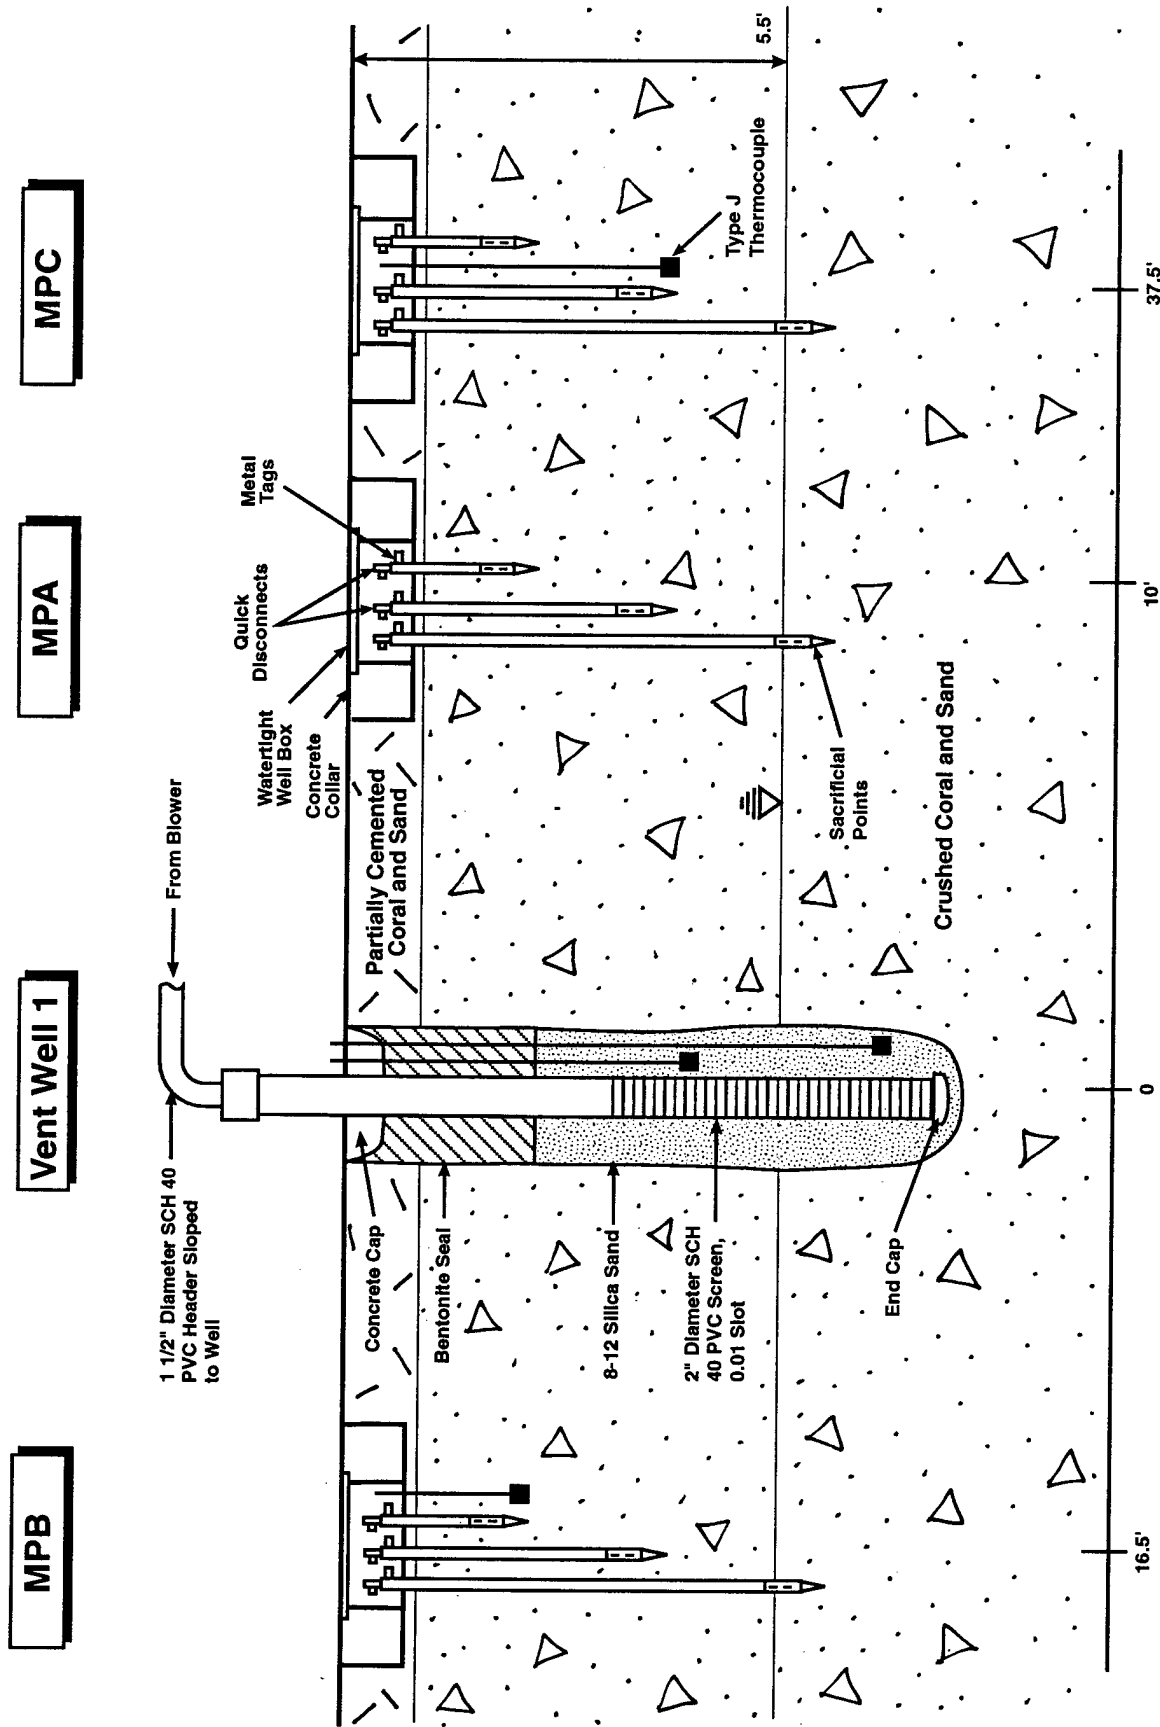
Cross Section of Vent Well and Monitoring Points at the Storage Tanks 260 and 261 Site Showing Site Lithology and Construction Detail (not to scale)
